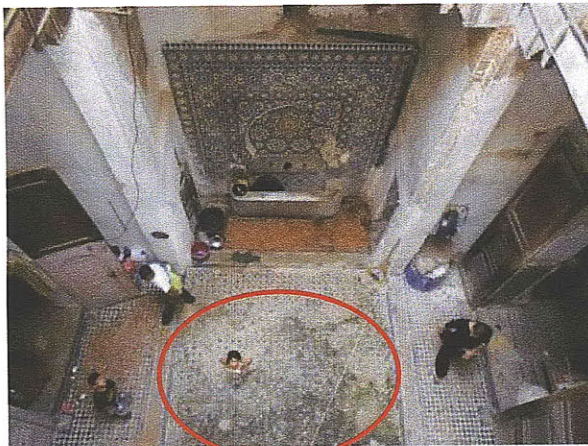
WATER DAMAGE TO FLOORS
